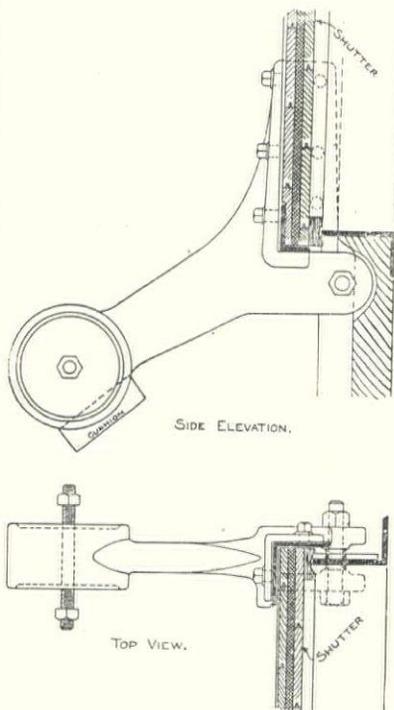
DETAIL OF COUNTERWEIGHT.
